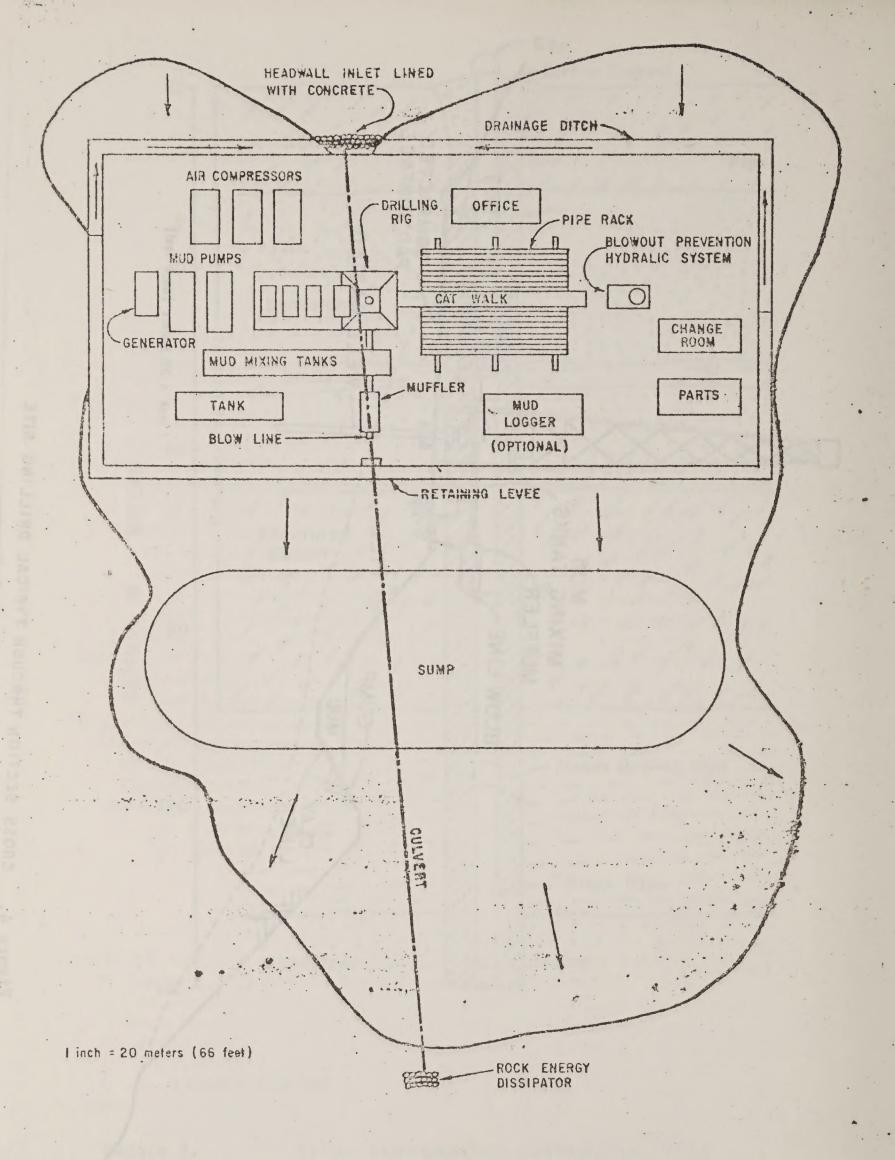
TOP VIEW OF A TYPICAL DRILLING SITE
